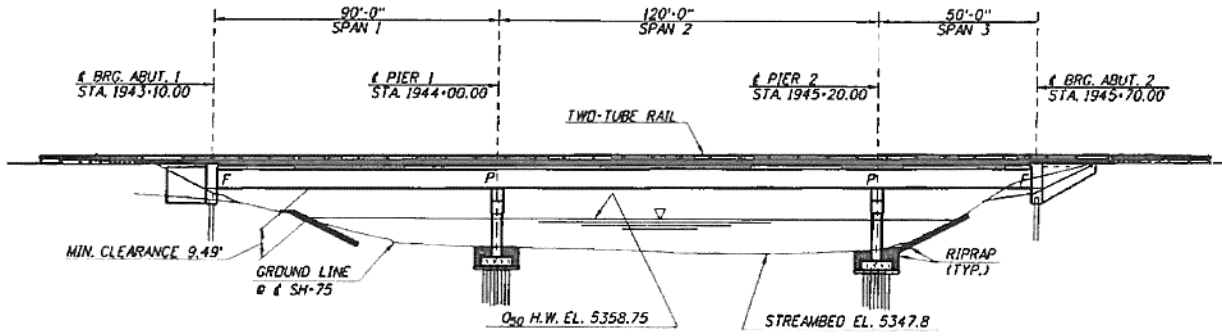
Elevation View of the Bridge on SH-75 over Salmon River (NTS)
